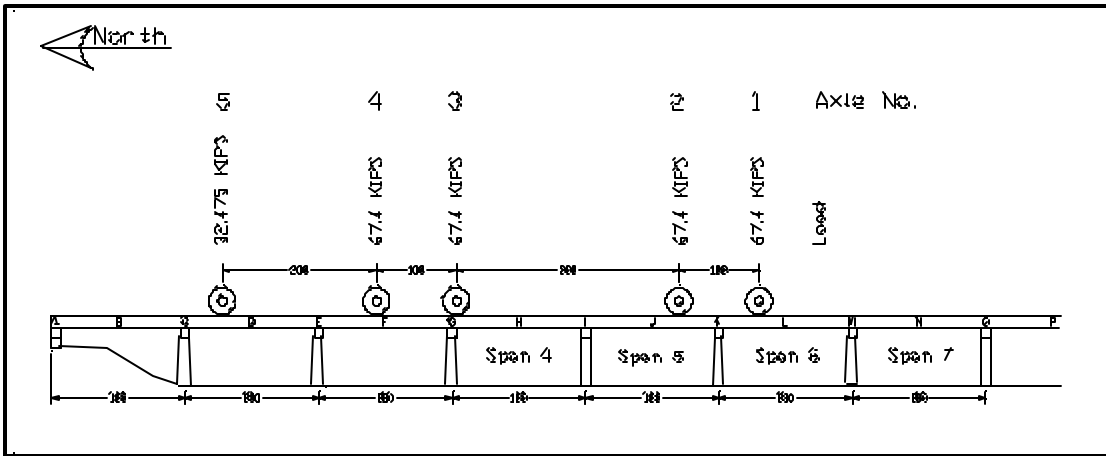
Loads applied to Bridge 32.35 due to load position 1-2@K. Dimensions are in inches.
